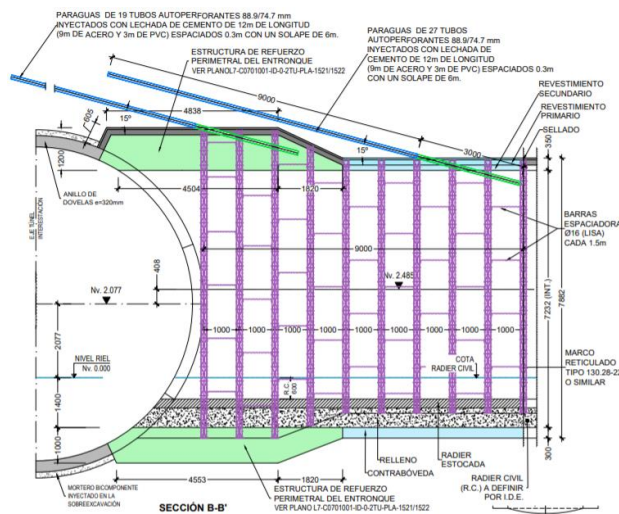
Ventilation Shaft intersection with interstation tunnel Design. Source: Geodata
